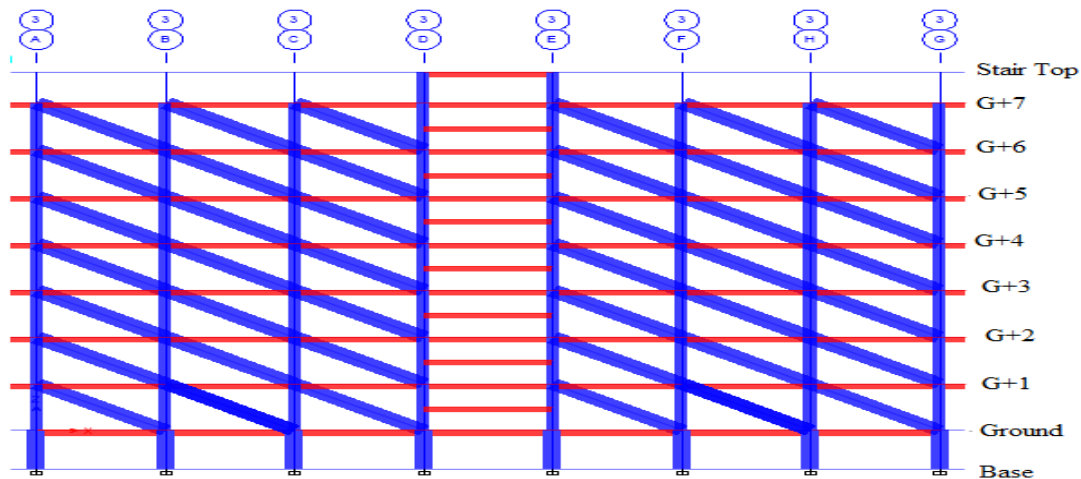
10 Diagonal strut modeling of walls using ETABS 2017
